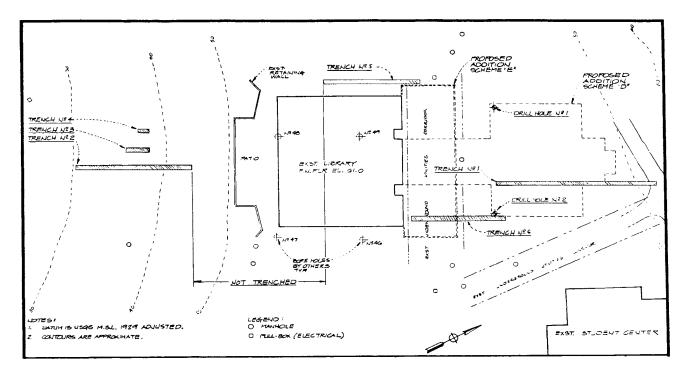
Plot Plan of Project Site Showing Location of Trenches
